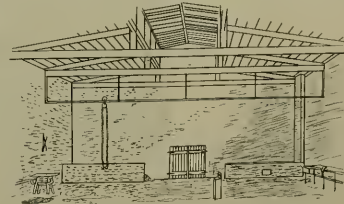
INTERIOR VIEW OF BACK END OF SHOP.
